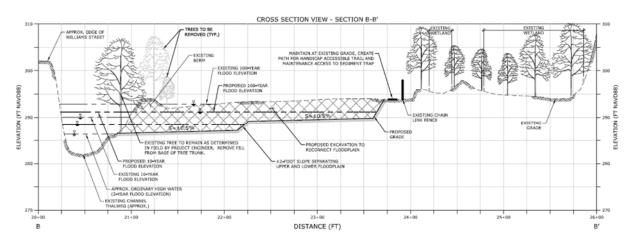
Design cross section of the proposed floodplain restoration site near Williams Street in Brattleboro. (Source: MMI, 2018)
